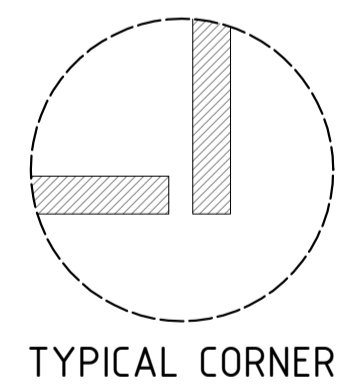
DETAIL A - TYPICAL EXTERNAL CORNER DETAIL
